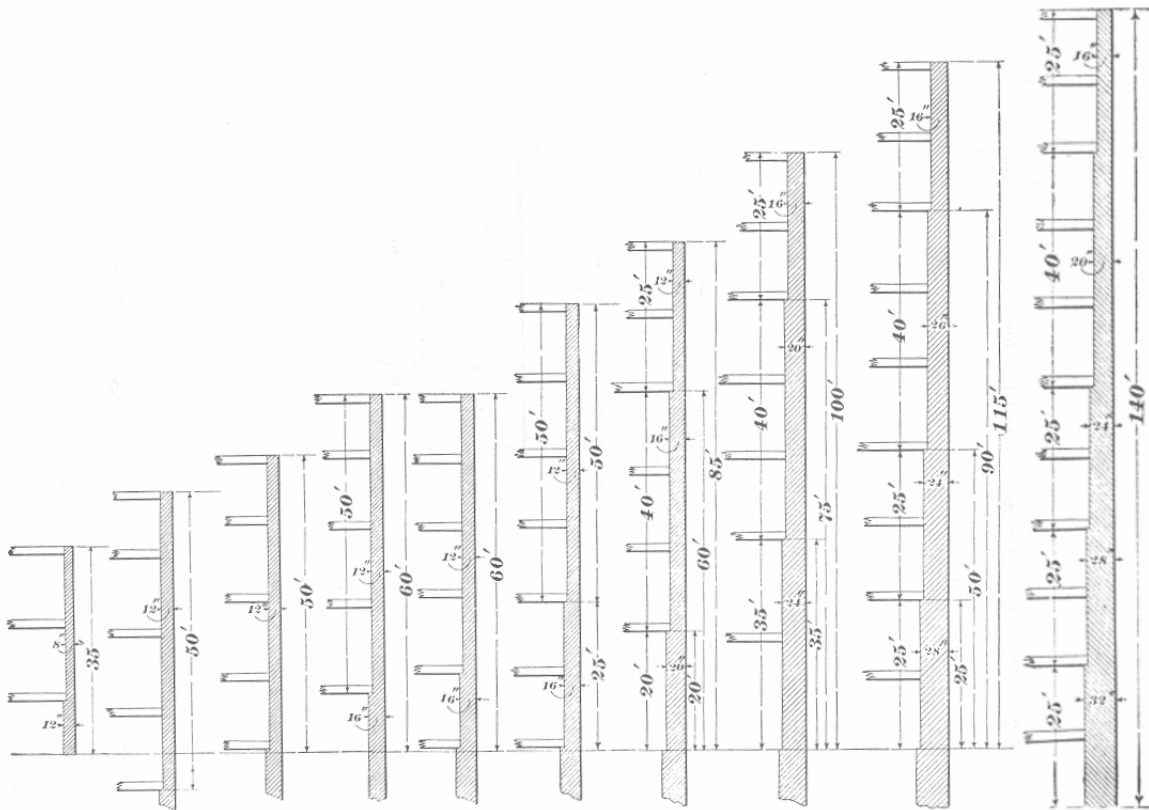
Standard thicknesses of masonry walls for dwelling houses per the building law of New York (figure taken from Lavica 1980)
